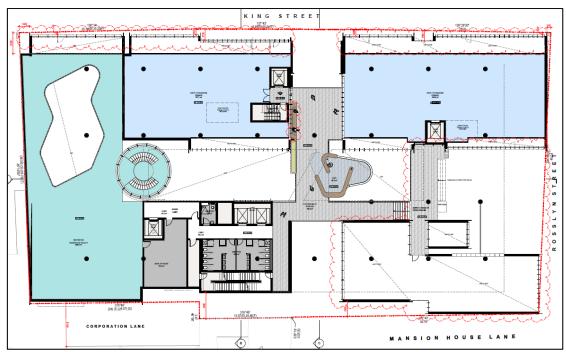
Mezzanine Floor Plan (Drawing No. TP01.06)
